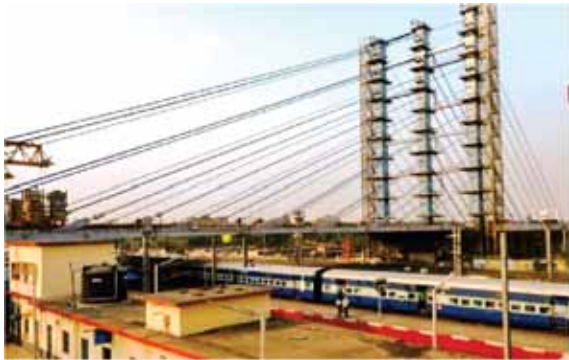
Cable stayed bridge constructed over Bardhaman Railway yard.
